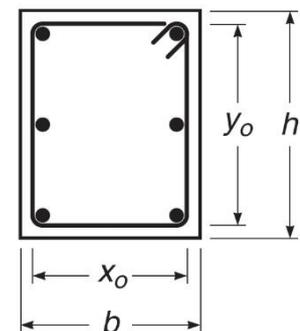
Notations for shear flow path after cracking of a reinforced concrete beam.
